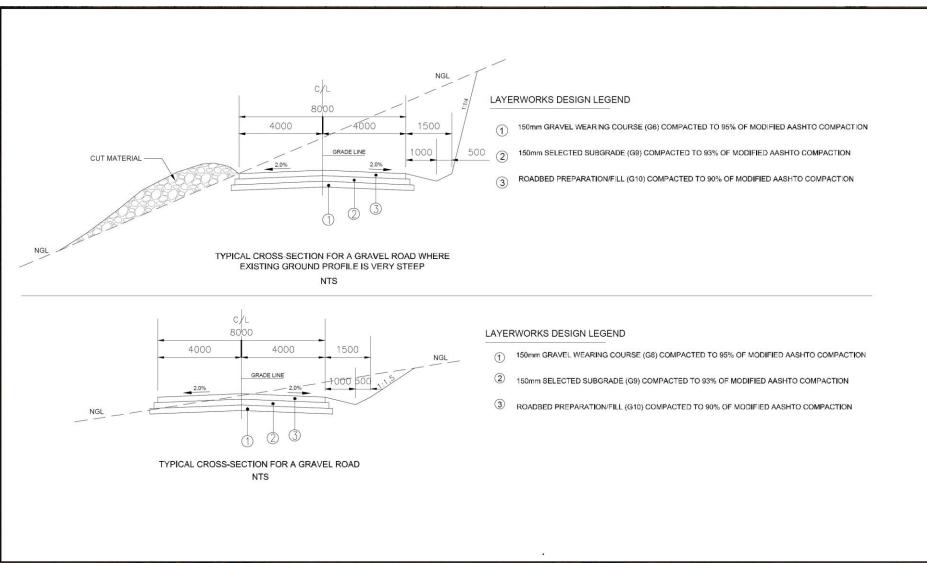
Transfer tunnel - - Typical cross sections for road categories
